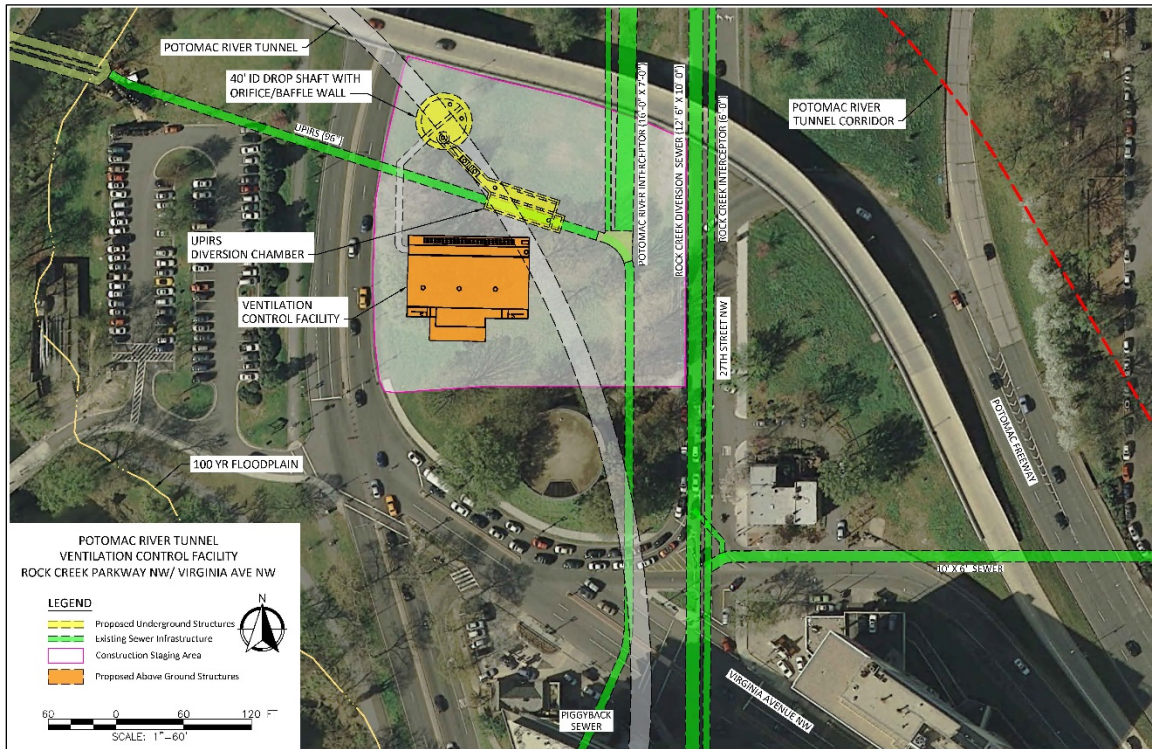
Ventilation Control Facility and UPIRS Diversion Structure Site
